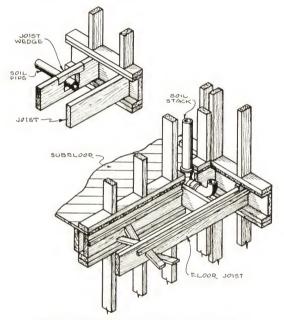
Other Ways of Reinforcing Joists Which Have Been Cut
